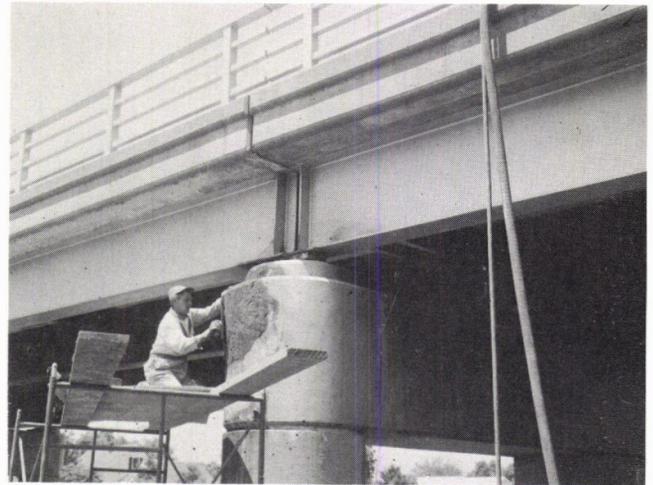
Shotcrete repairs to pier cap, New York Thruway.
